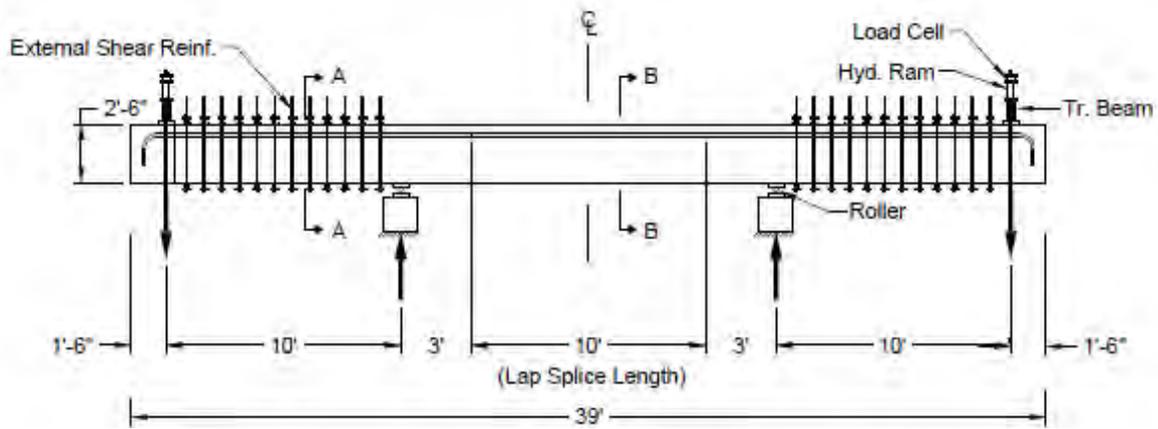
Test Girder, Series A Purdue Tests (120 in splice)
